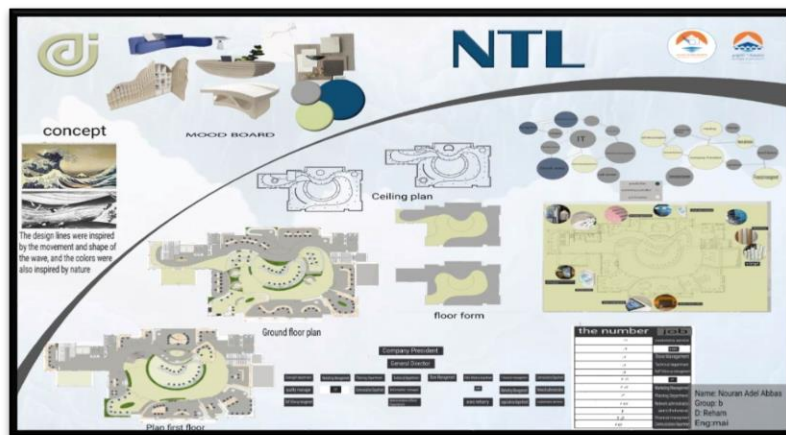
The final plan panel for the idea. The final design of the horizontal project includes the form panels, furniture, ceiling, and plank, explaining the technologies used..
